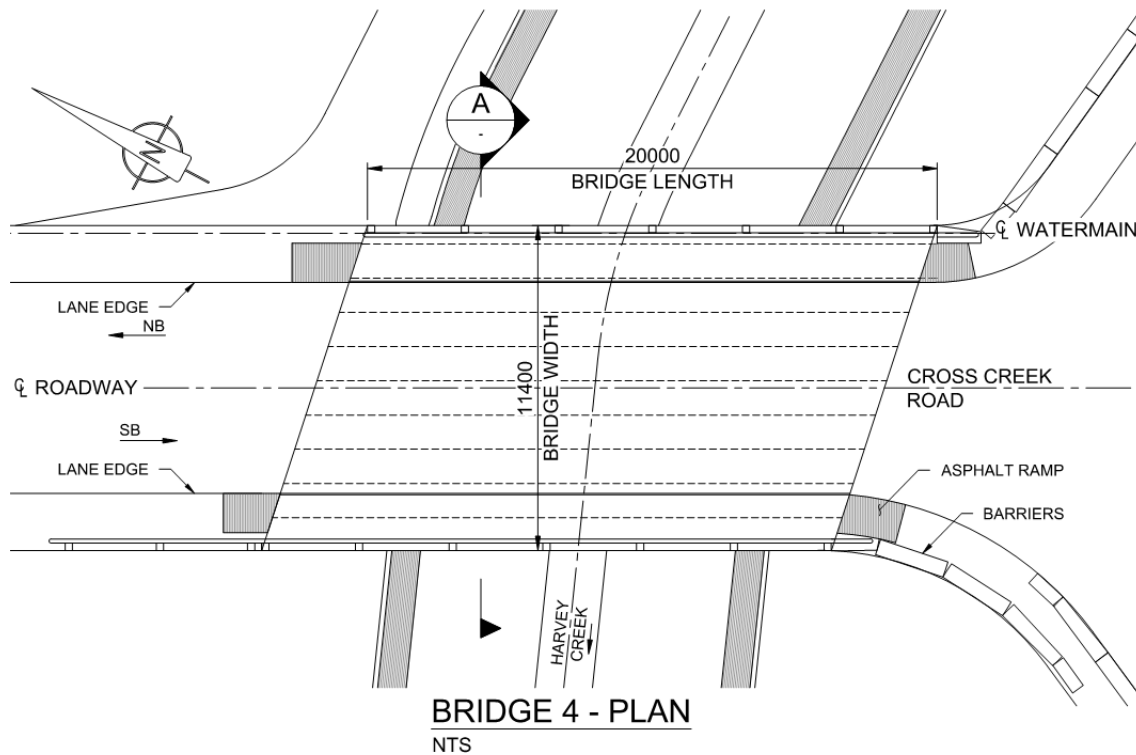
Cross Creek Road Bridge over Harvey Creek – Plan
